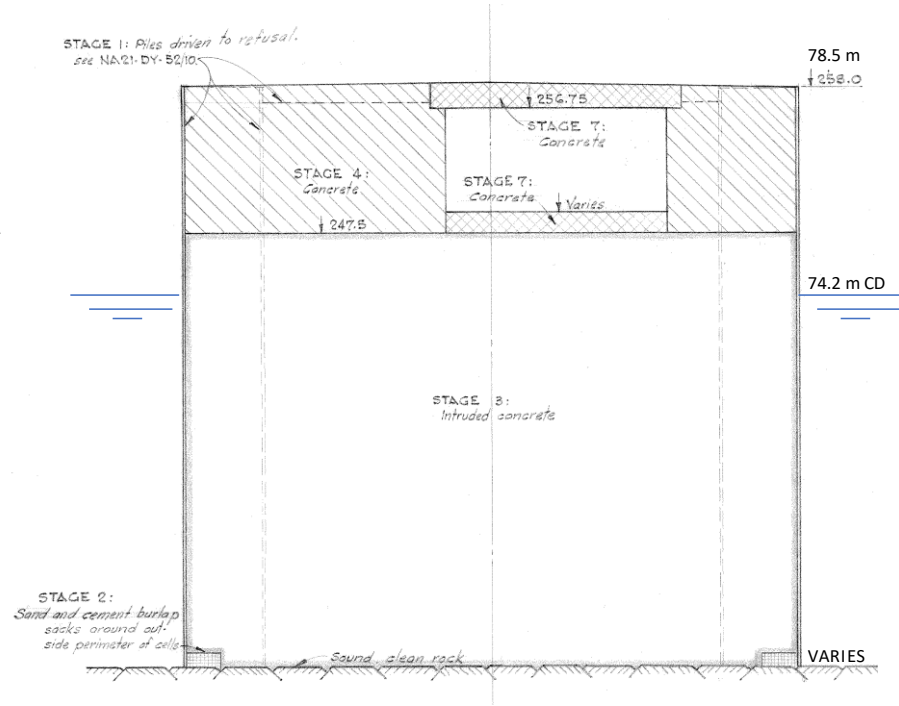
Typical cross-section of cellular steel sheet pile Western Pier with conveyor tunnel
